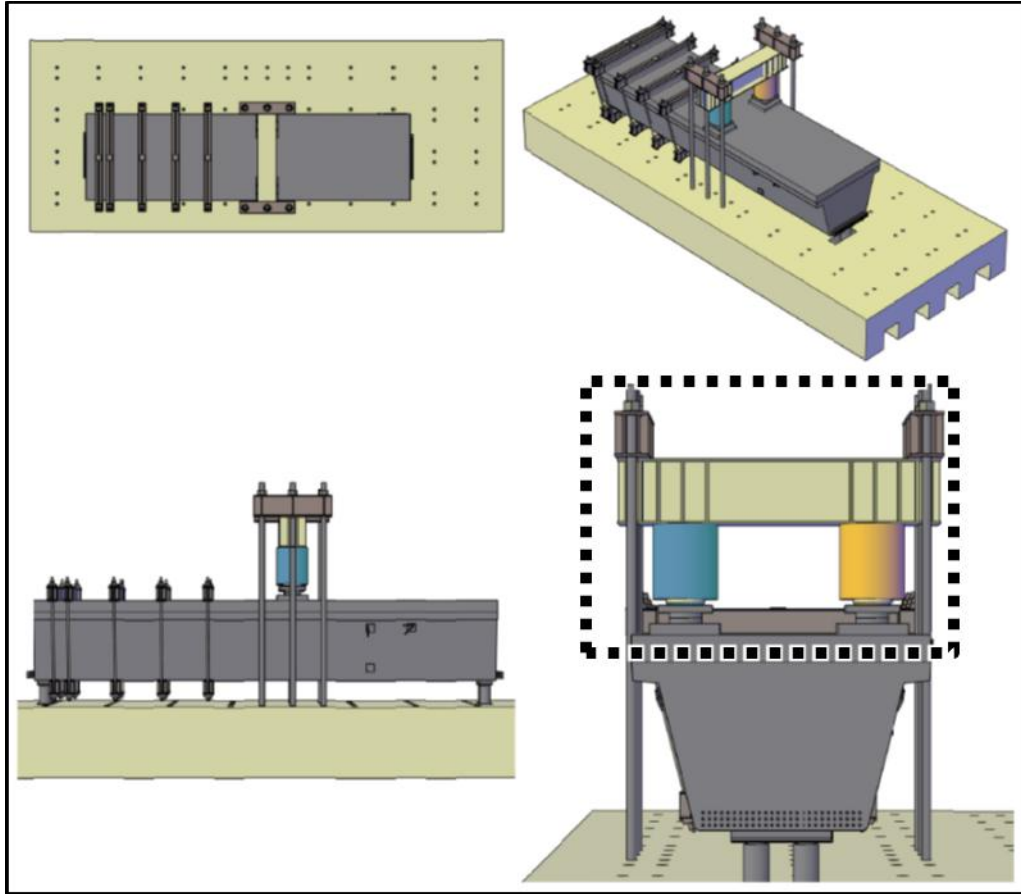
Shear test frame mounted on elevated strong floor at FSEL
